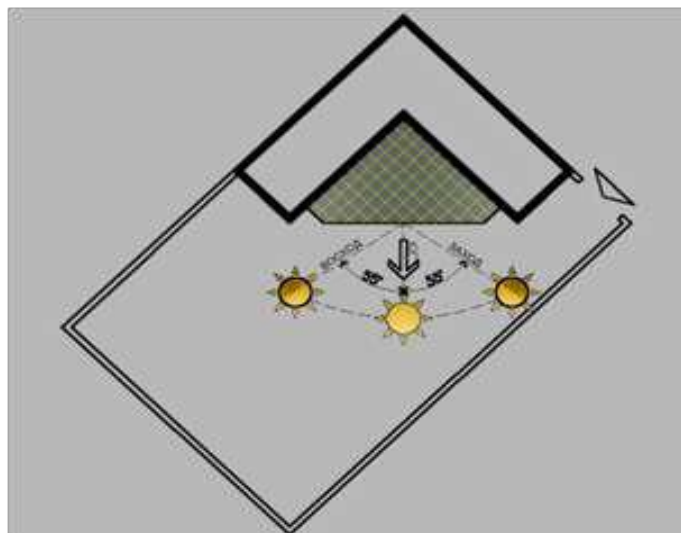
"G" shaped plan of the helio-house diagonal direction streets.
